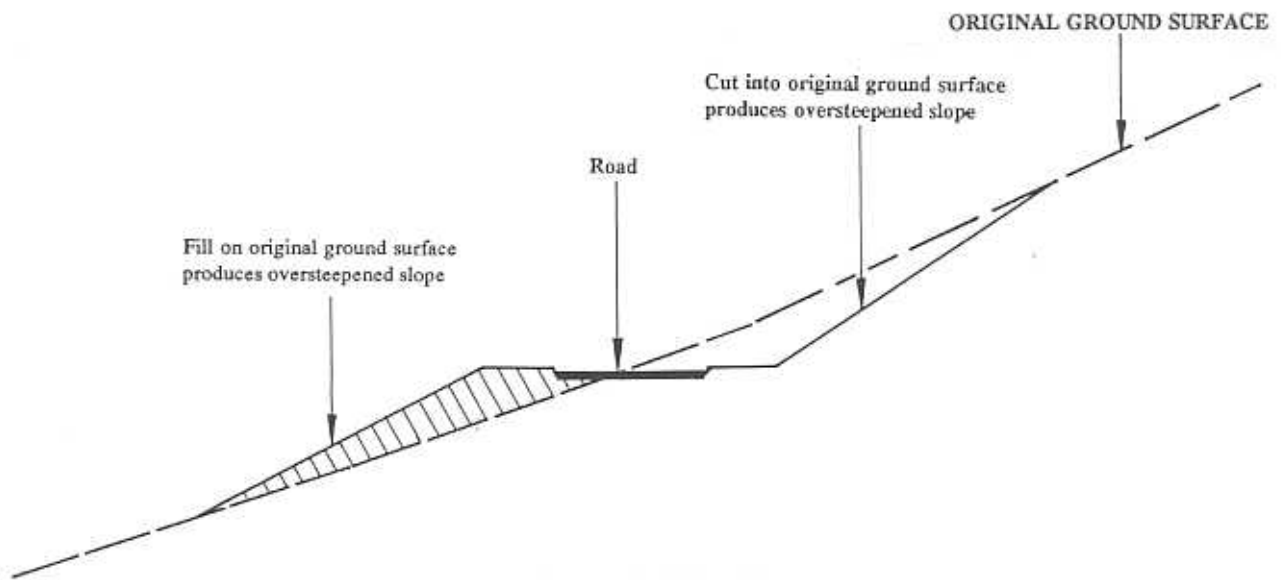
Sketch cross section of a typical hillslope "cut-and-fill" construction used for road development.
